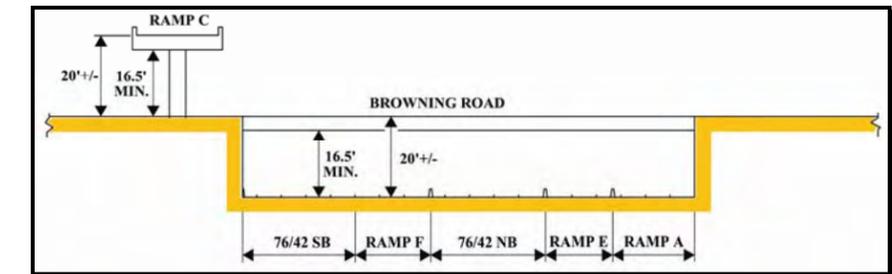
Section A-A at Browning Road (Alternative J)
